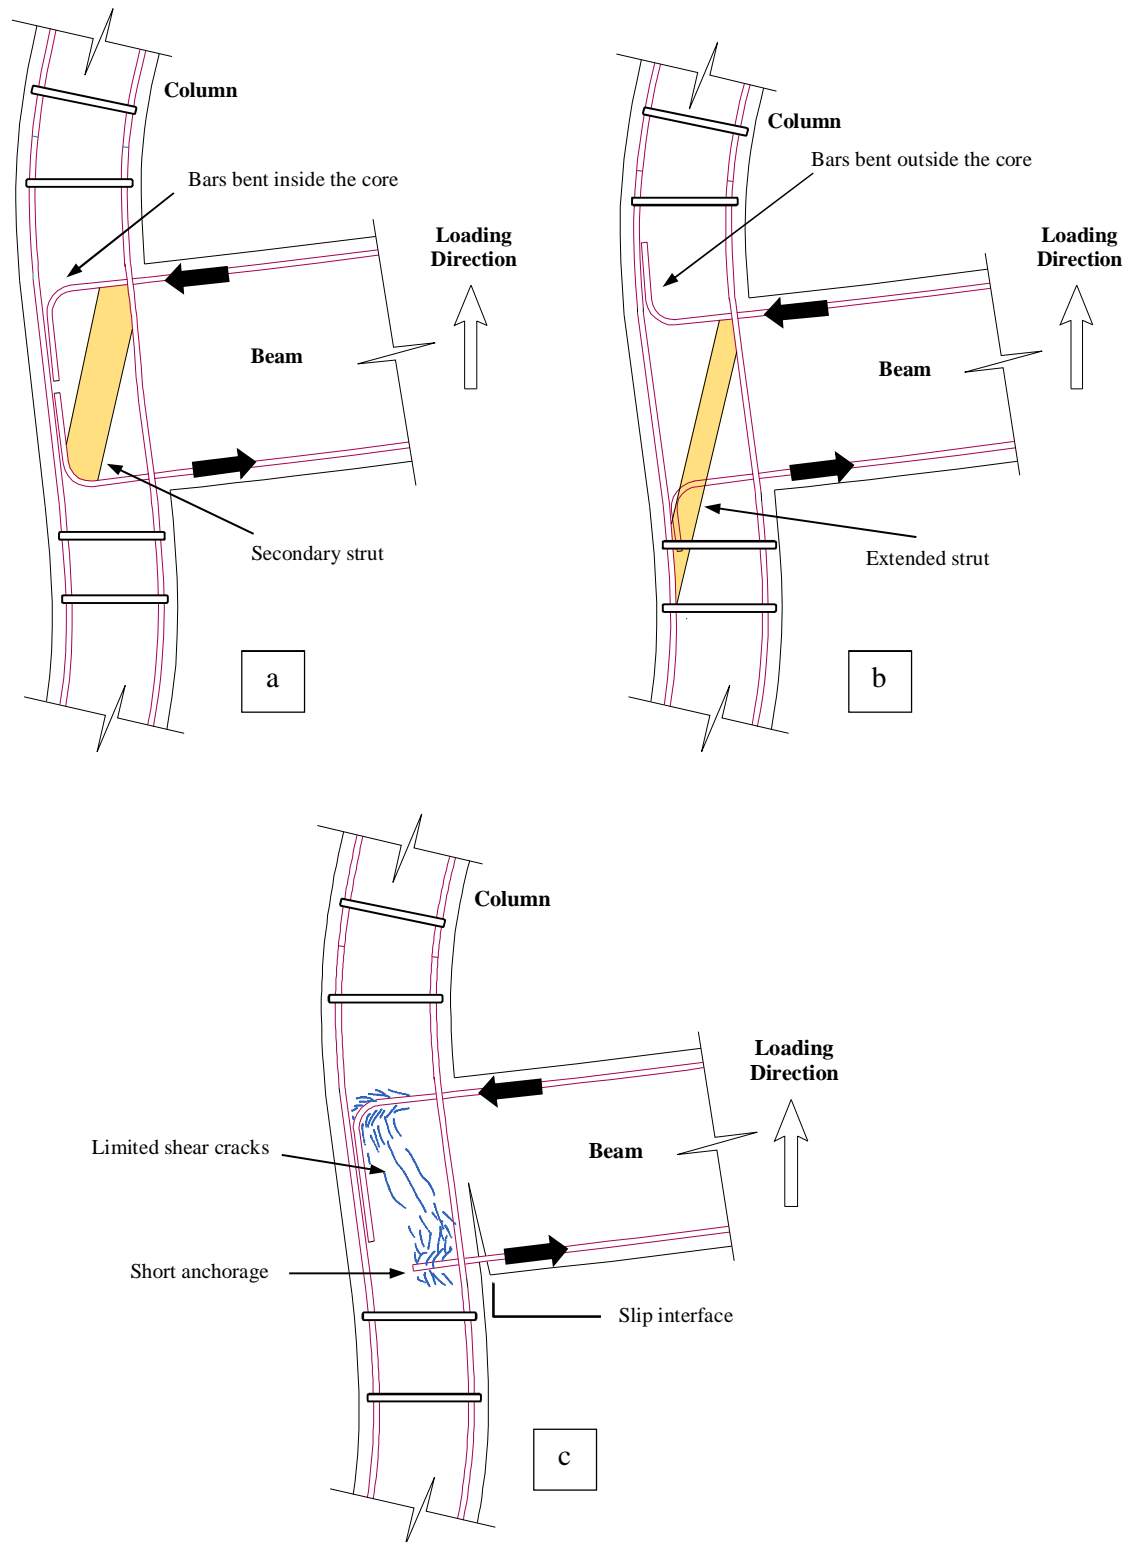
a) Secondary strut mechanism, b) extended strut mechanism and c) short beam bottom bar anchorages
